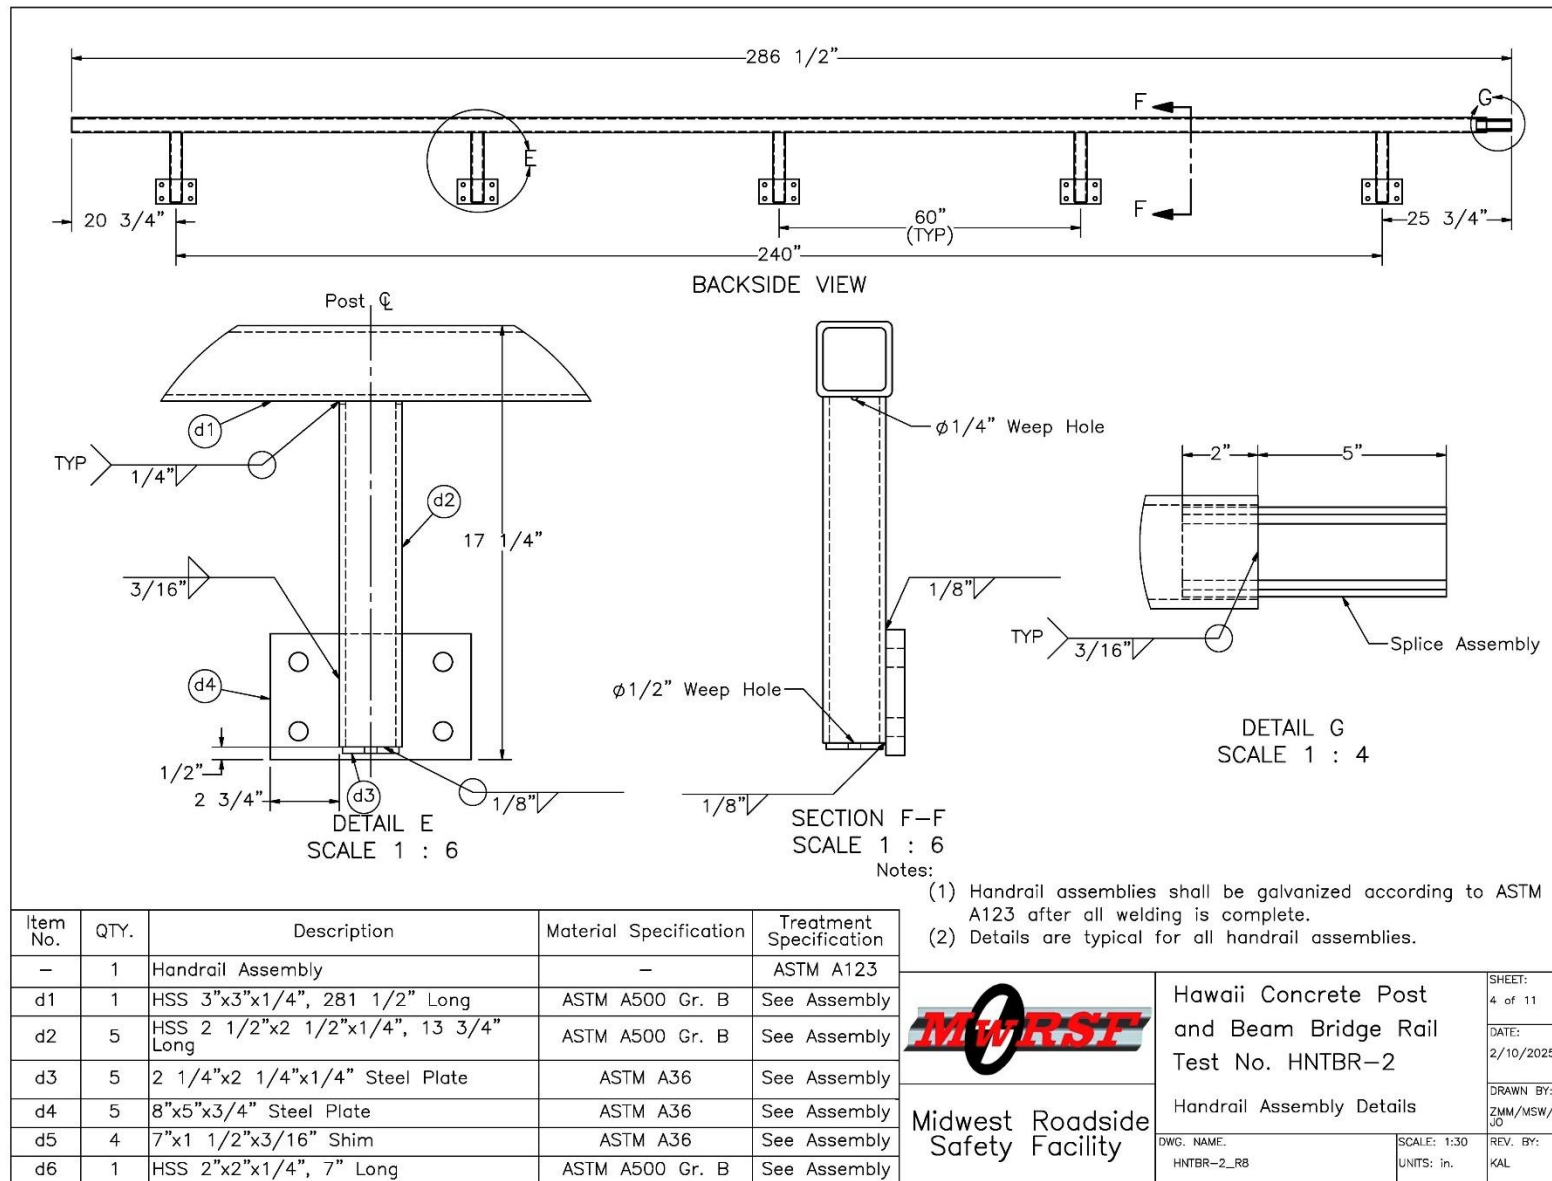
Handrail Detail, Test Nos. HNTBR-2 and HNTBR-3
